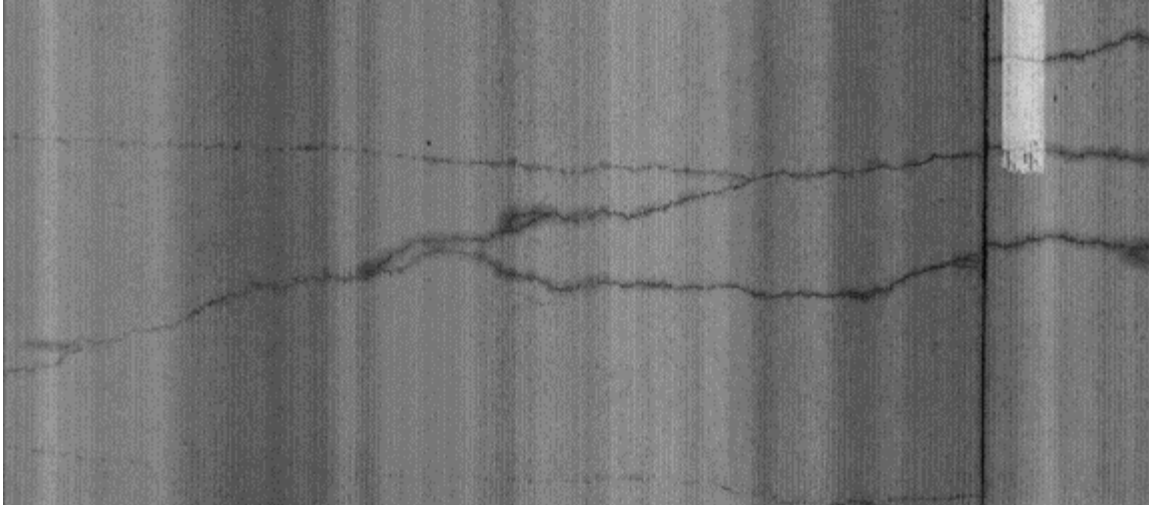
High-severity transverse crack on CRC pavement [IL 390 westbound, approx. MP 13.286].
